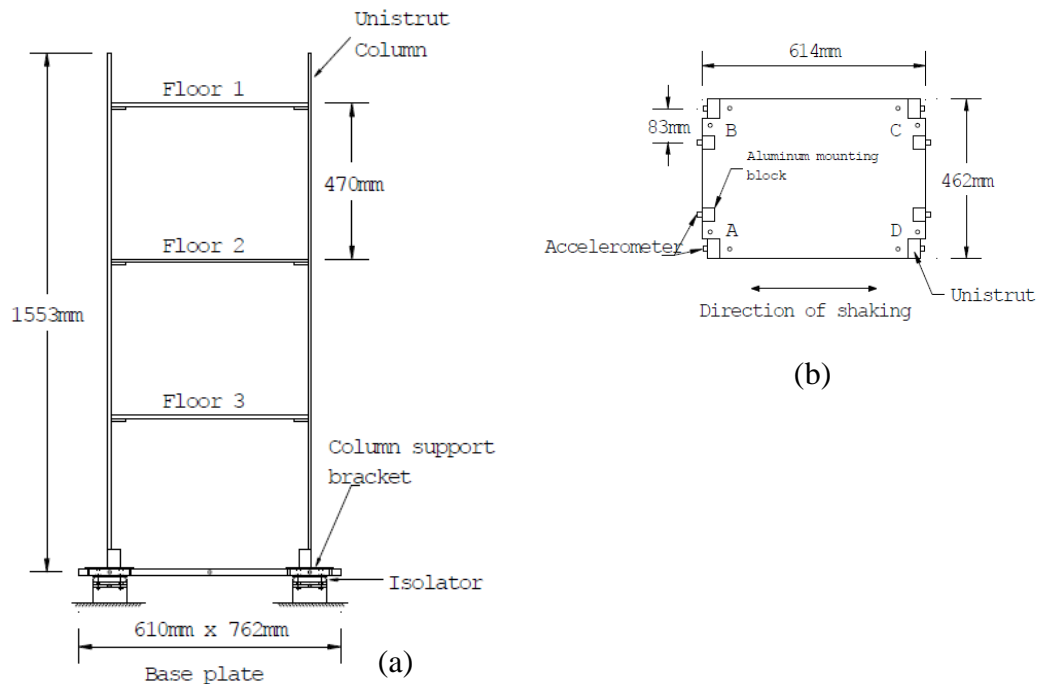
Basic dimensions of the 3-storey frame structure (a) side elevation and (b) floor layout (plan elevation) (Beskhyuroun et al. 2006)
